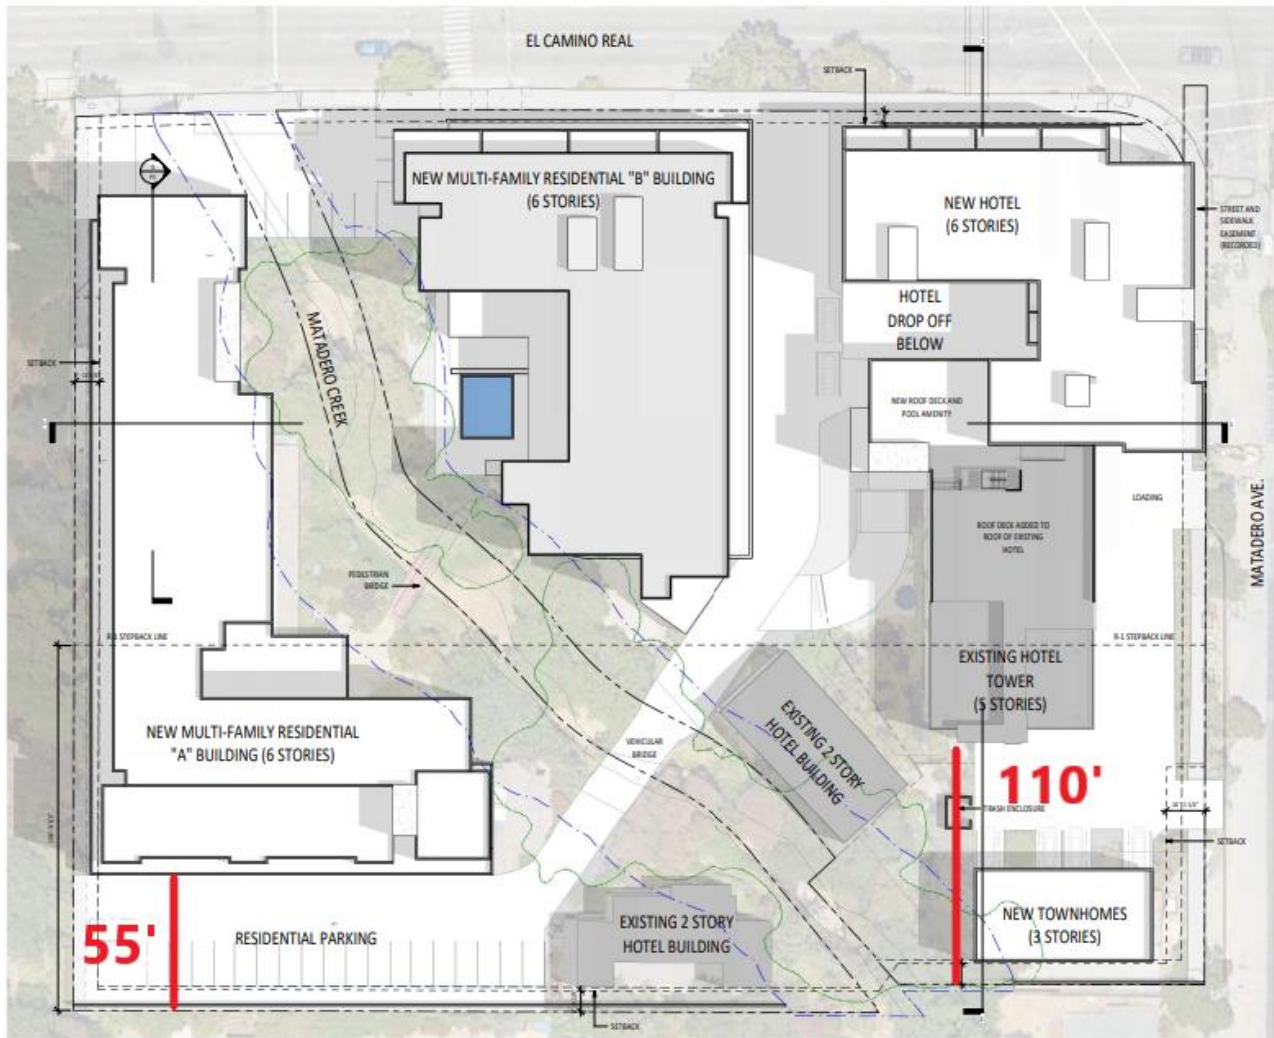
June 2023 Proposed Site plan – note rear building setbacks and existing >50' hotel building within 150' of rear property line
